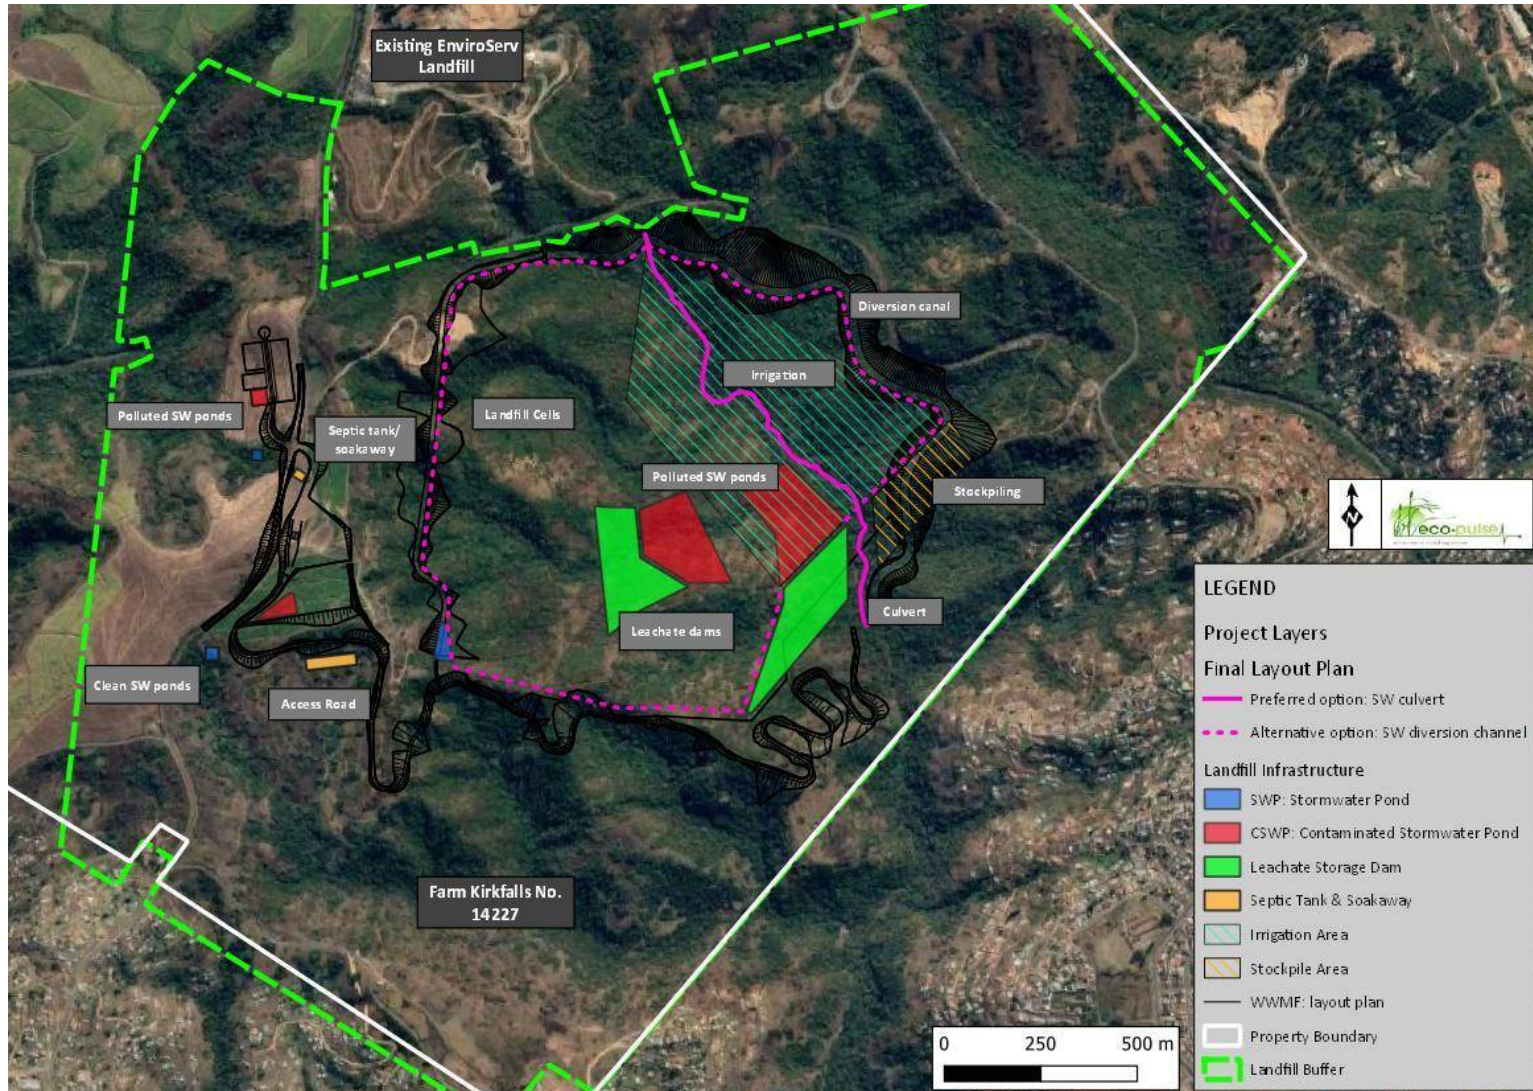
Layout plan and map showing the proposed WWMF Landfill development and related infrastructure.
